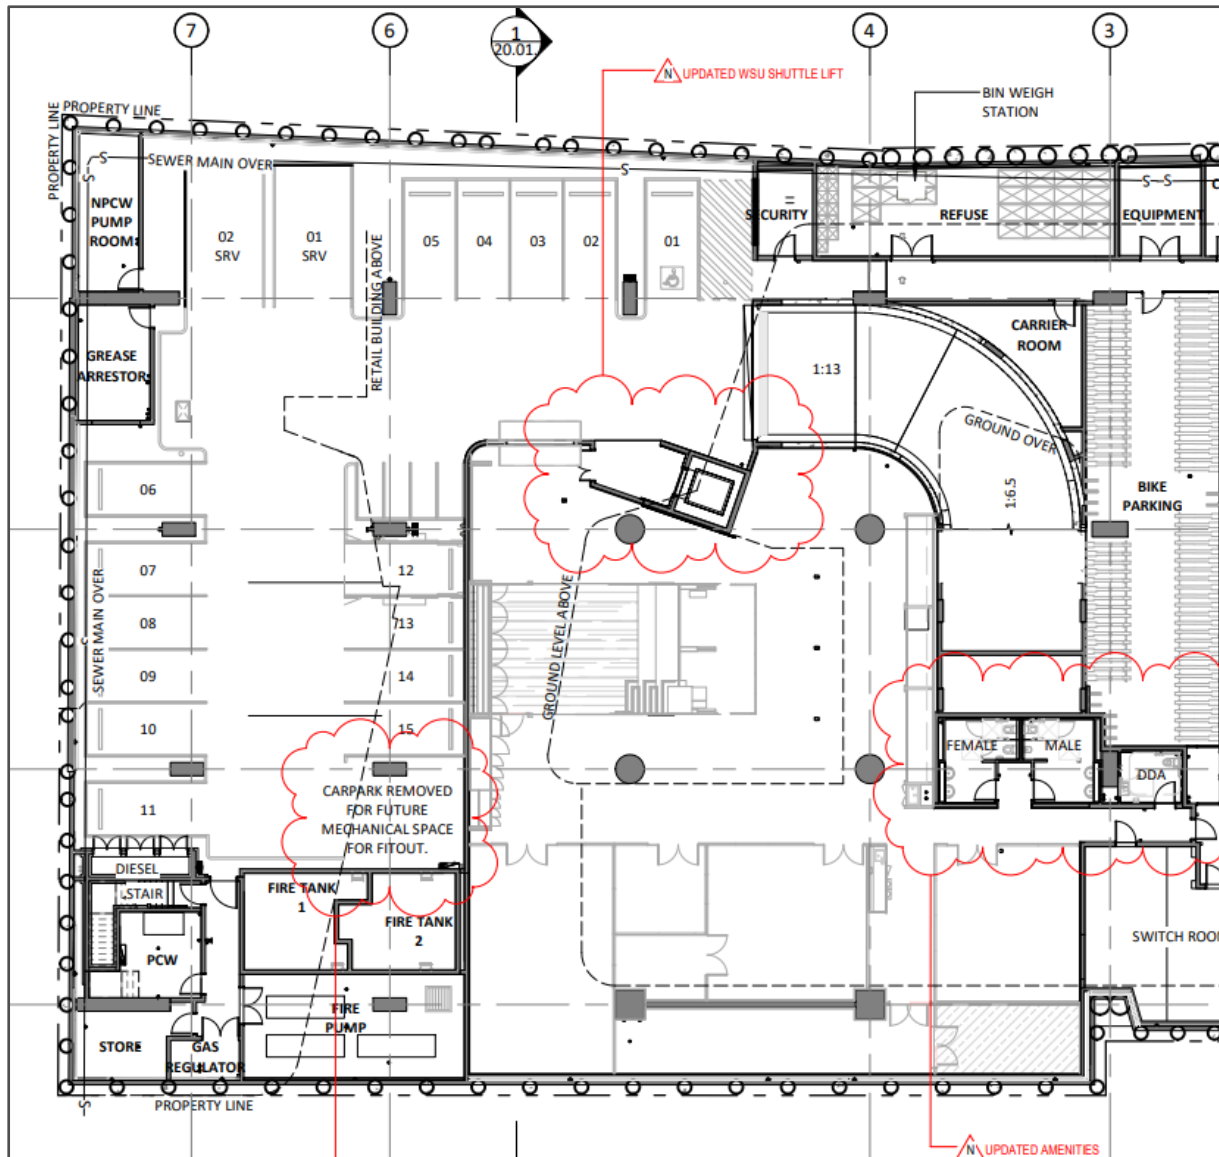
| Proposed changes to Basement level and end of trip facilities (Source: Modification Report)
